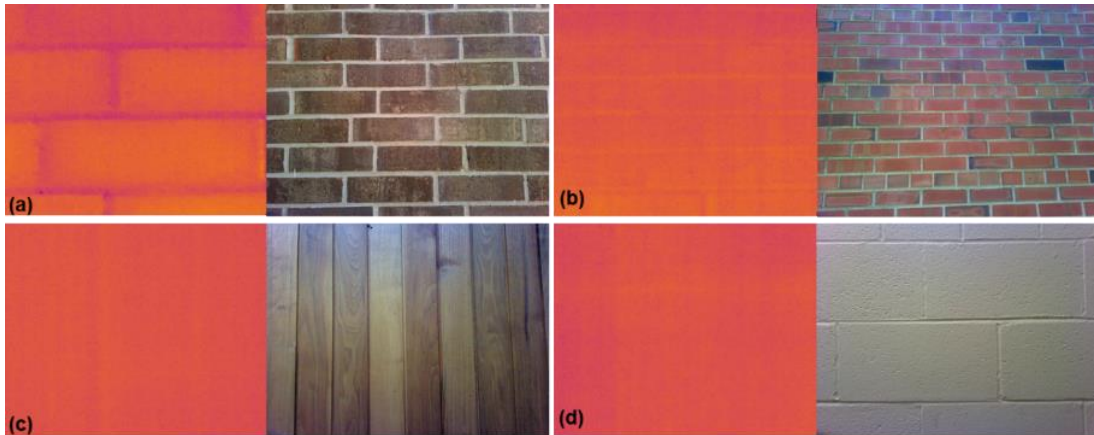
Examples of Thermal and Digital Images Captured from Different Building Surfaces: (a) exterior brick wall; (b) brick wall; (c) interior wooden wall; (d) interior concrete masonry wall
